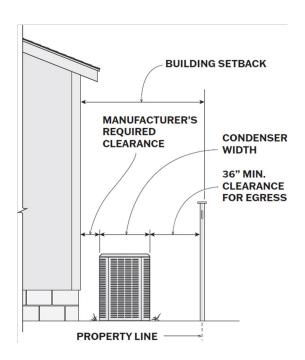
Mechanical Equipment Side Yard Setback Encroachment
